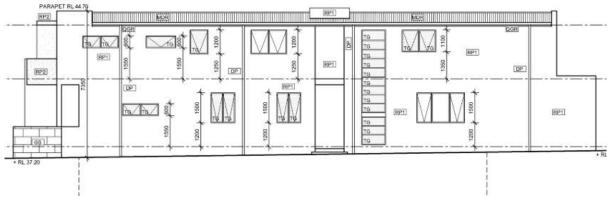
East elevation of the proposed dwelling house (source: N Lycenko Architect, dated May 2020)
